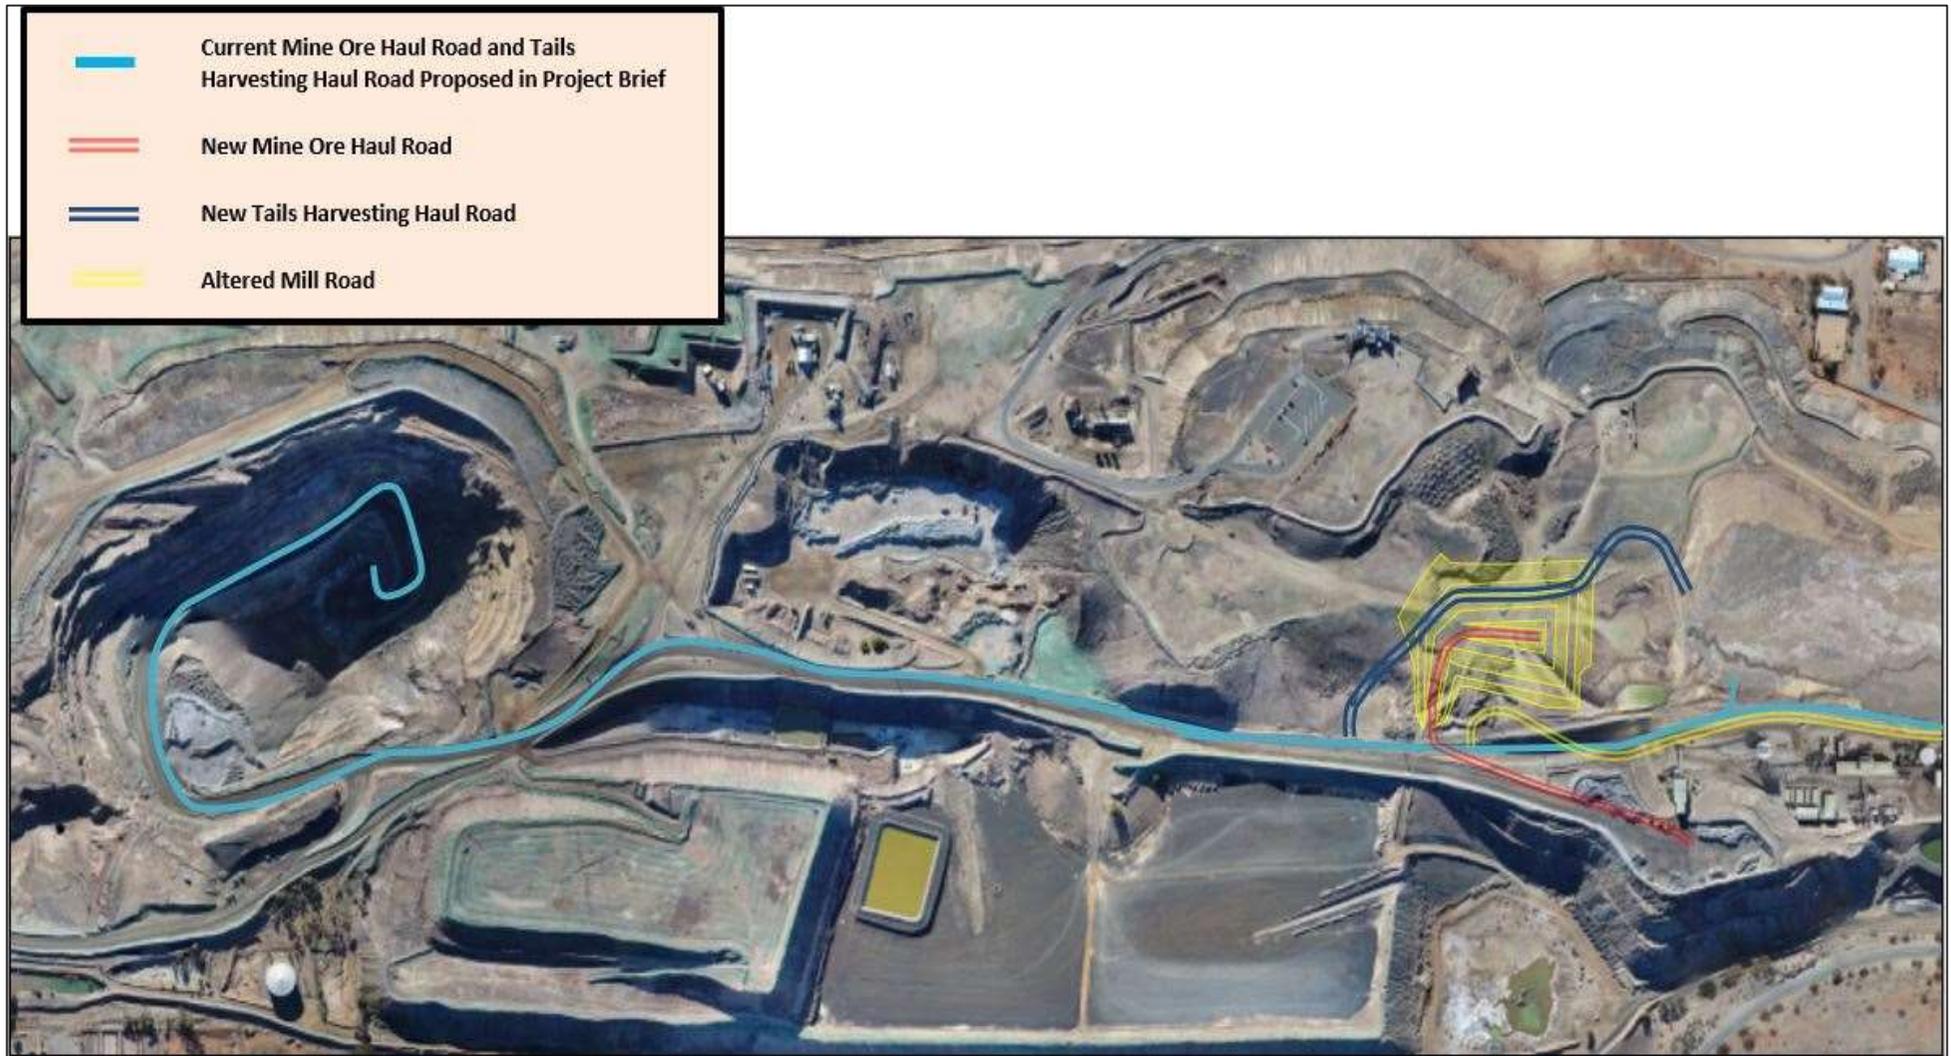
Current mine haul roads and proposed new tailings harvesting haul road
